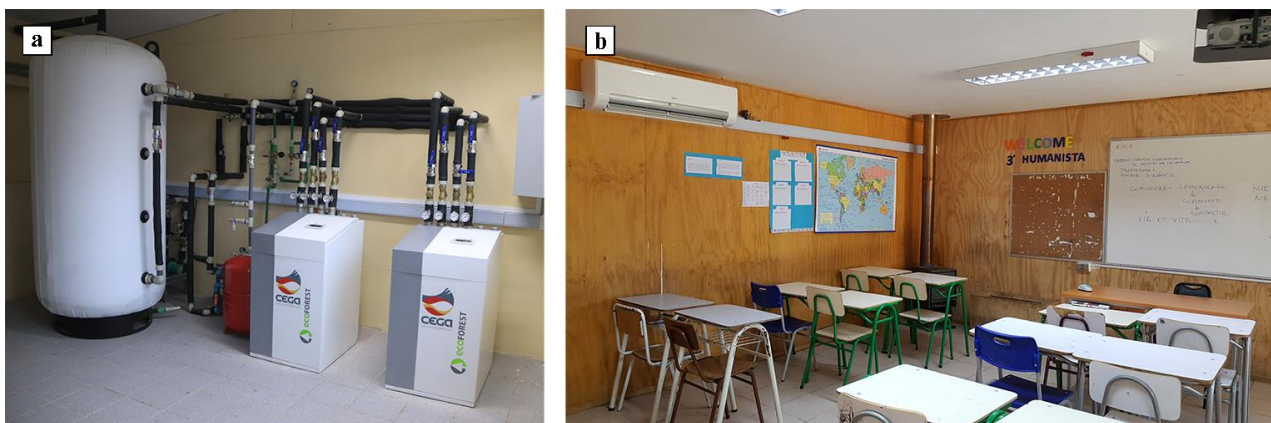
Installation pictures. a) Geothermal heat pumps, buffer vessel and others equipment inside the mechanical room. b) Fan coil inside a classroom.
